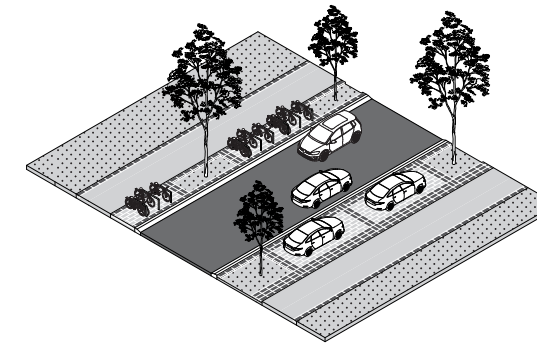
There are areas where there are physical barriers and not enough space for parking, where existing buildings are close to the road. When this occurs, parking is not an option in order to maintain the ability to have access to the multi-use path system. Features like gardens, bike parking and seating can be added in lieu.
